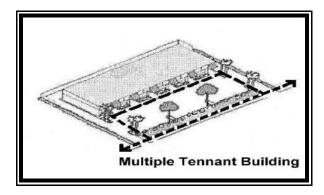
Exhibit K: Example of a Recommended Pedestrian Facility within a Parking Lot
